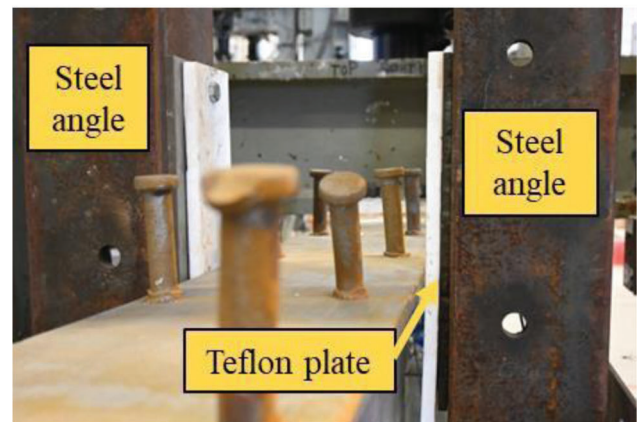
Steel angle (lateral bracing): spreader beam connection.
